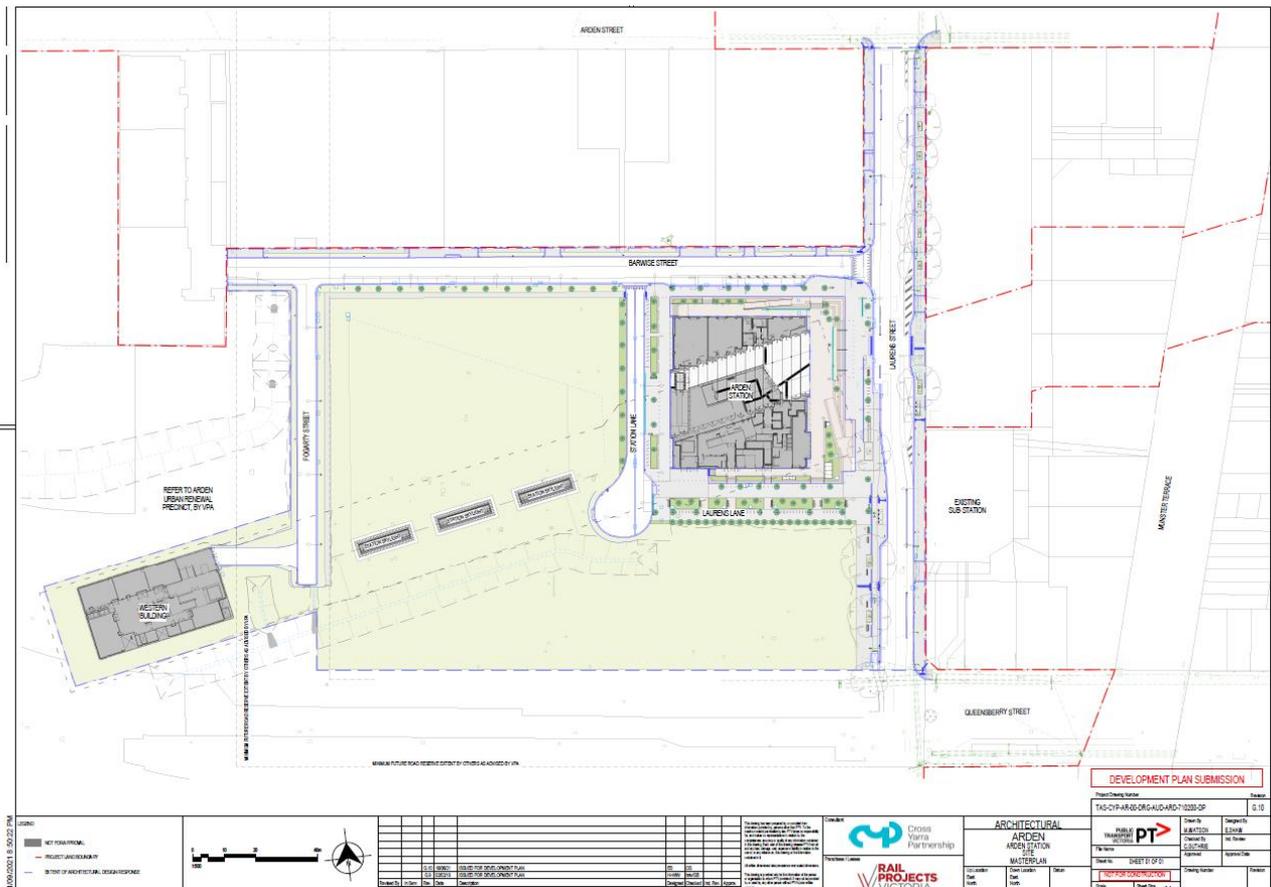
Arden Development Plan Site Layout Plan, Source: RPV
